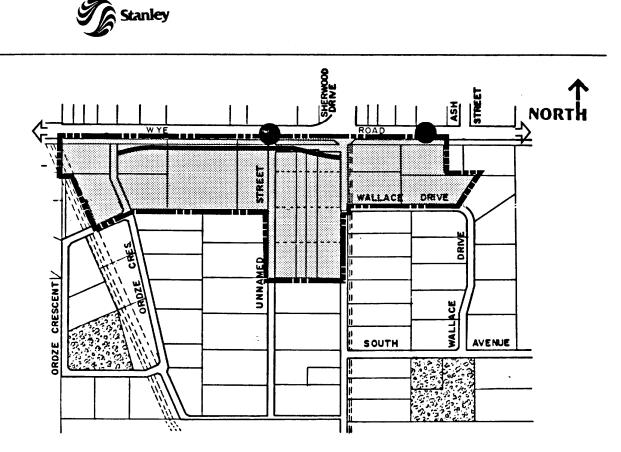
SERVICE ROAD CONCEPT OPTION No.1 FRONT SERVICE ROAD TIGHT BULB
